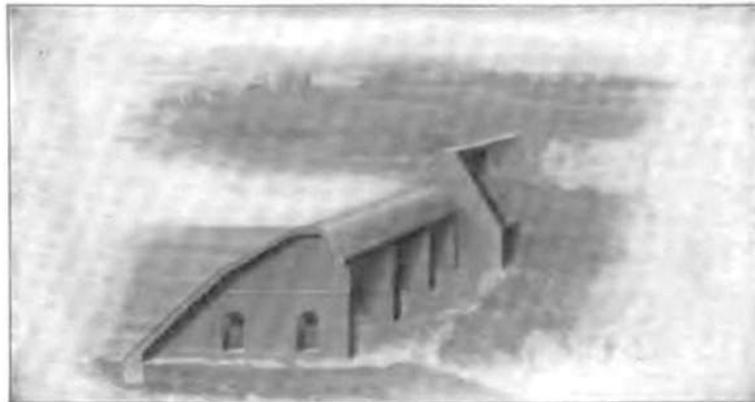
SECTION OF CONCRETE-STEEL CURTAIN-DAM.
